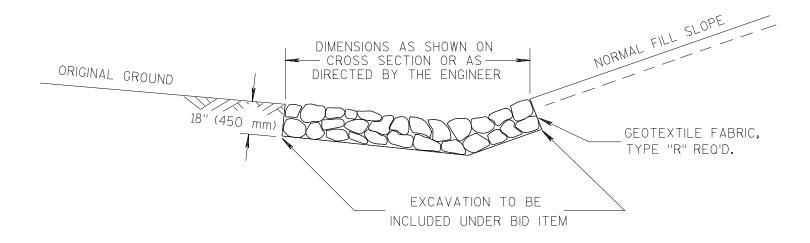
DETAIL FOR SPECIAL DITCH WITH HEAVY RIPRAP AND GEOTEXTILE FABRIC
